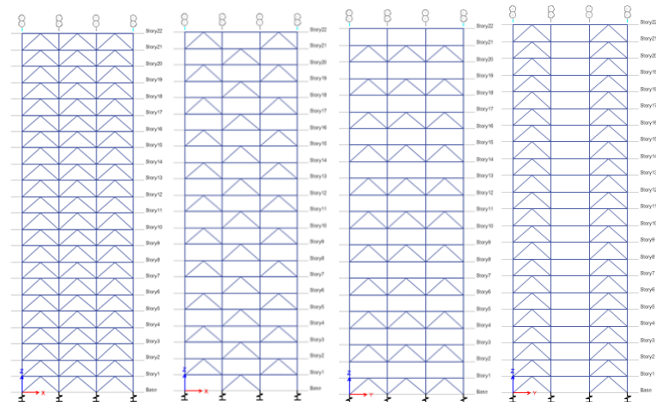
ELEVATION OF 22 STOREY DIAGRID BUILDINGS WITH INVERTED V BRACING PATTERN ARRANGEMENT ((A) WHOLE, (B) ALTERNATE, (C) HORIZONTAL, (D) VERTICAL)
